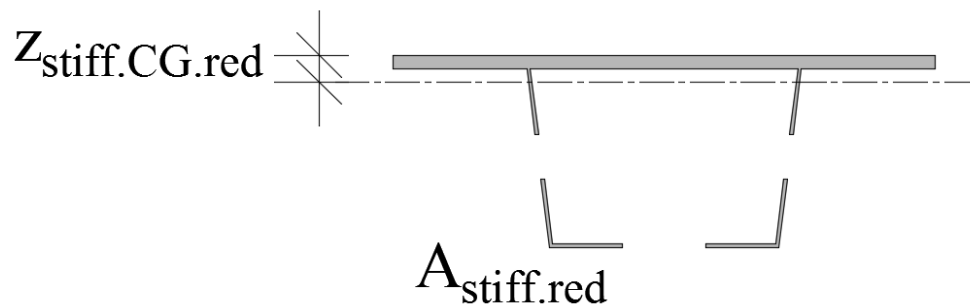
Area and centre of gravity of longitudinal stiffener.
